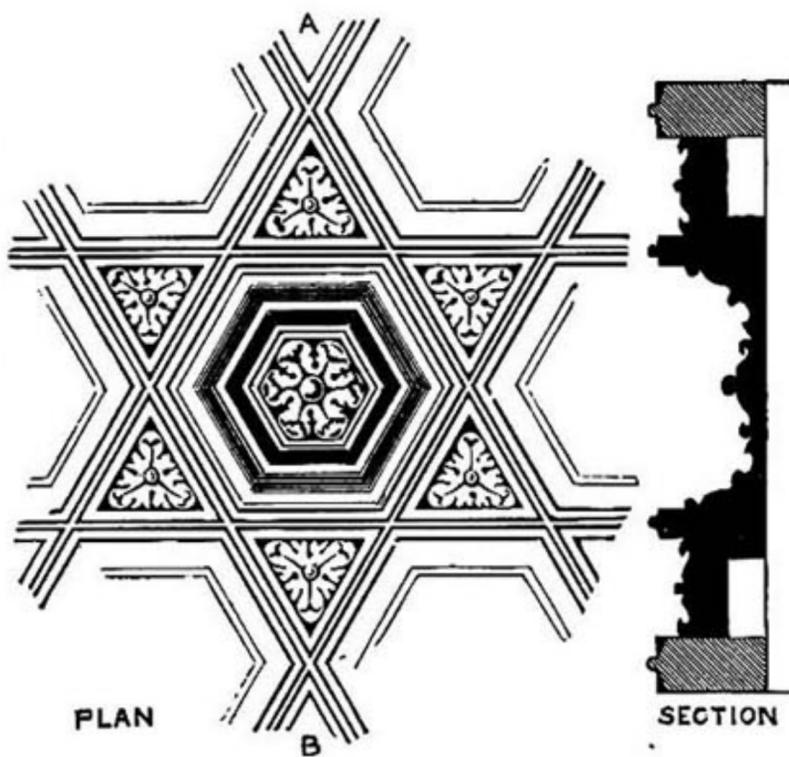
Single Compartment in Plan, and Section along A, B, in Plan. Café del Comercio, Murcia, Spain.
